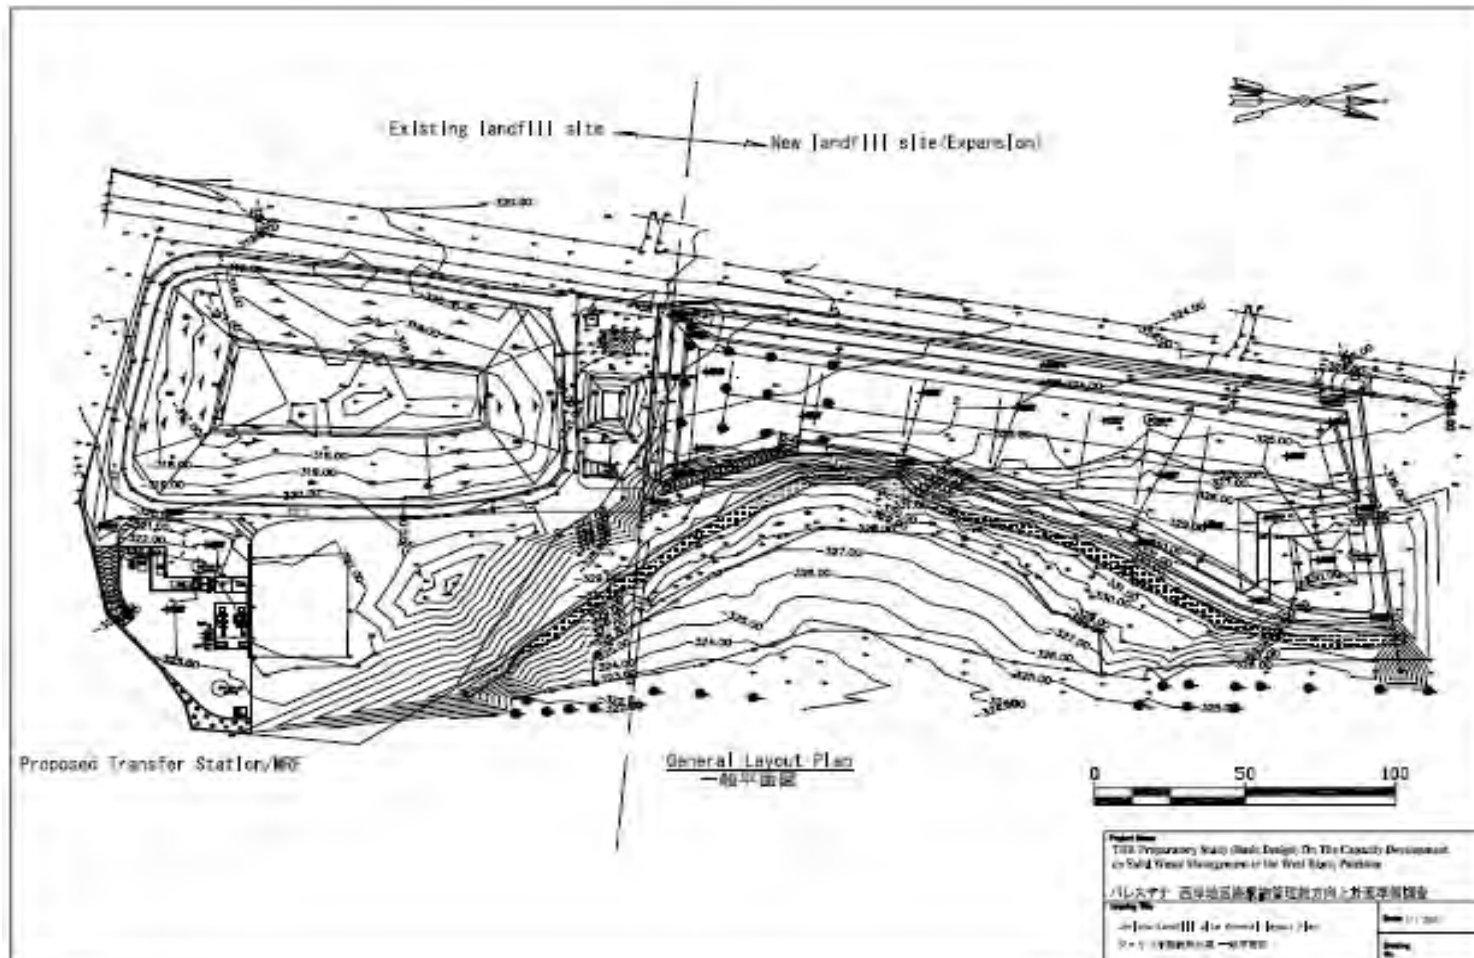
Plan of Extension of Final Landfill (Jericho JC)
